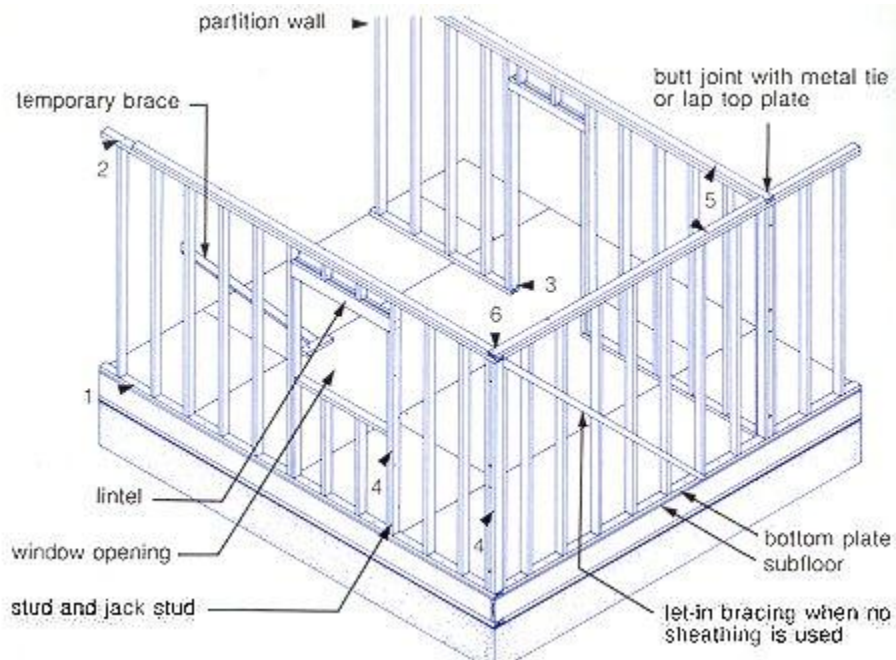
Typical Wood Frame Walls for Residential Construction (CMHC, 1989).
